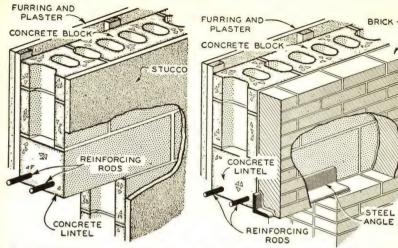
Use of Precast Reinforced Concrete Lintel in Concrete Block Wall
